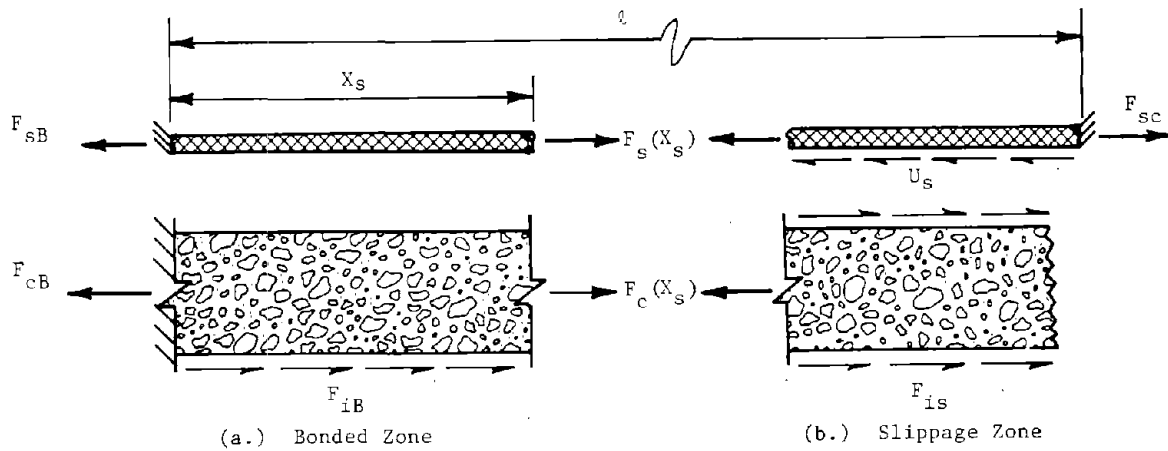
Free body diagram of a cracked reinforced concrete pavement.
